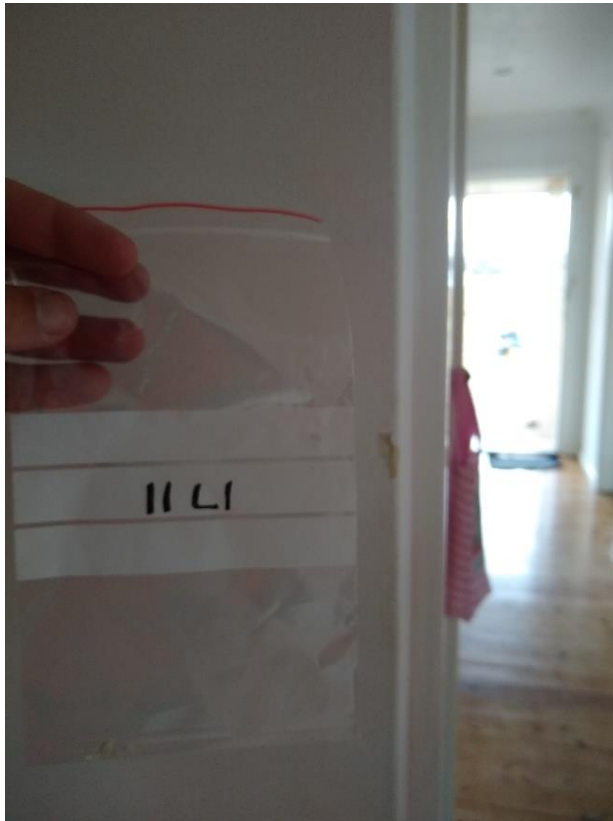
Building 11, interior, paint off timber frame within corridor, white paint, sample 11L1, no lead paint(s) identified
